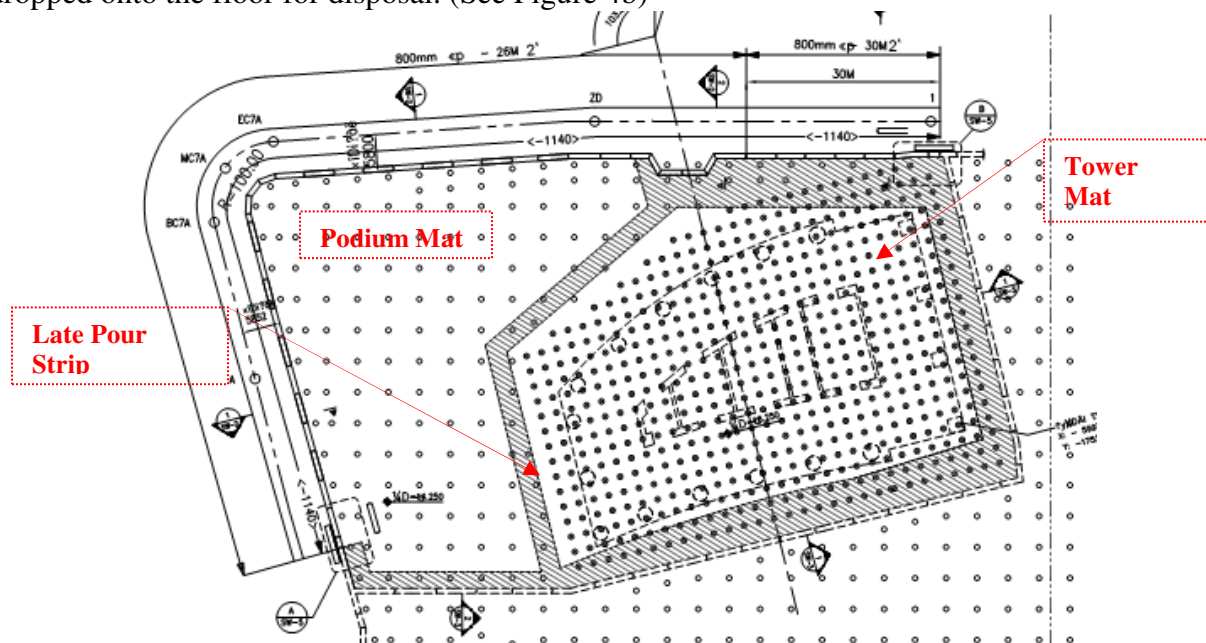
PILE FOUNDATION AND PILE LAYOUT
